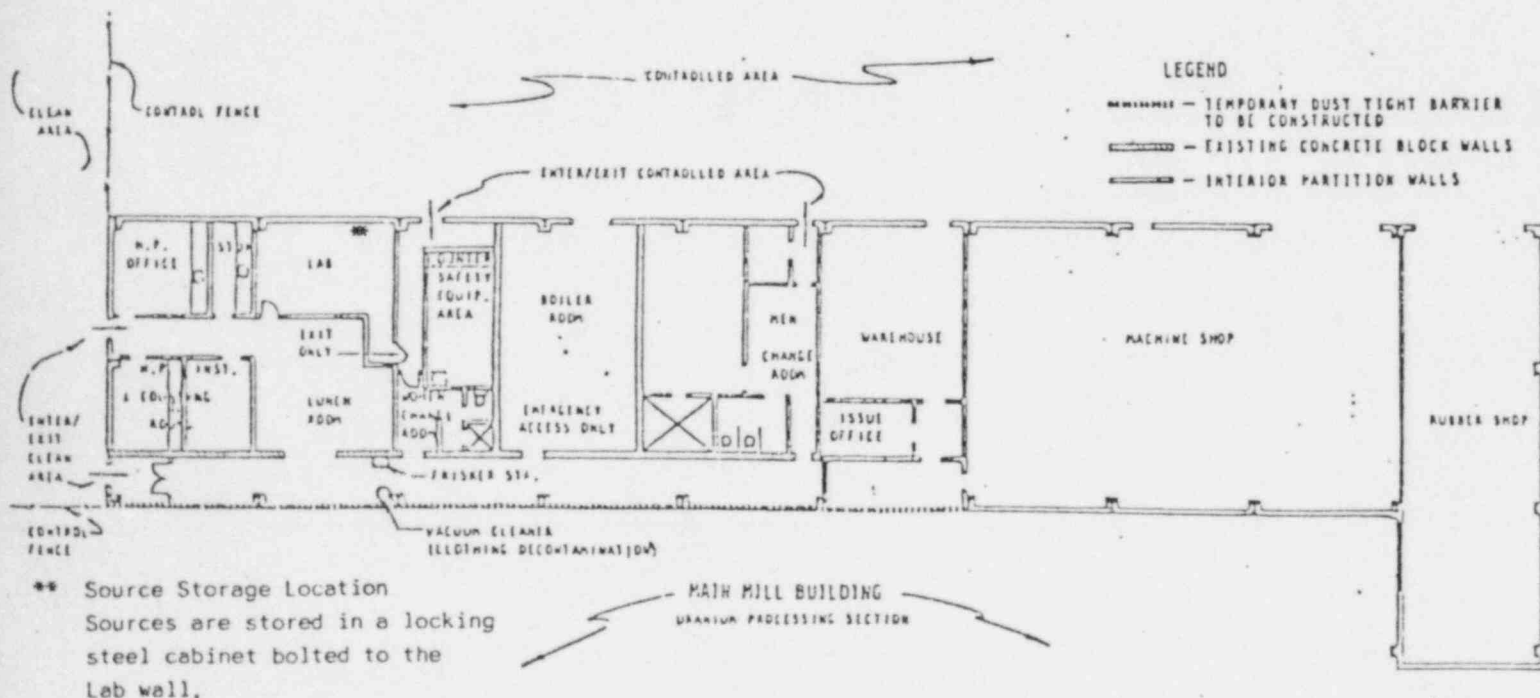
NORTH SECTION of the MAIN MILL BUILDING
